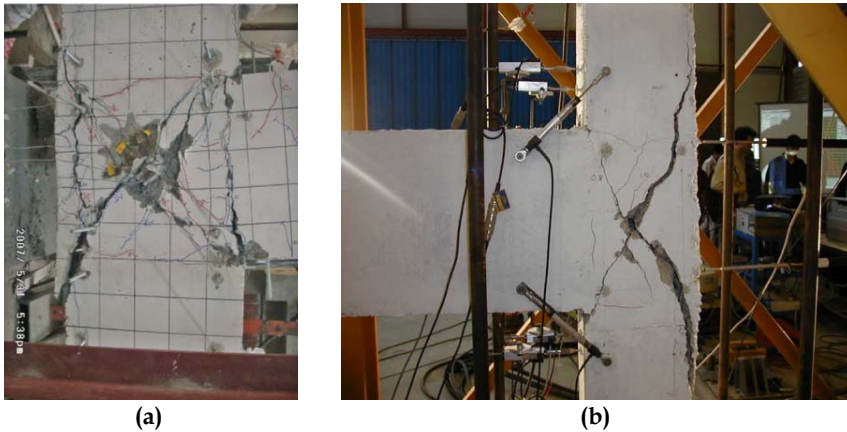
Joint panel diagonal tension failures: (Ilki et al., 2011) (a) and (Calvi et al., 2002) (b).
